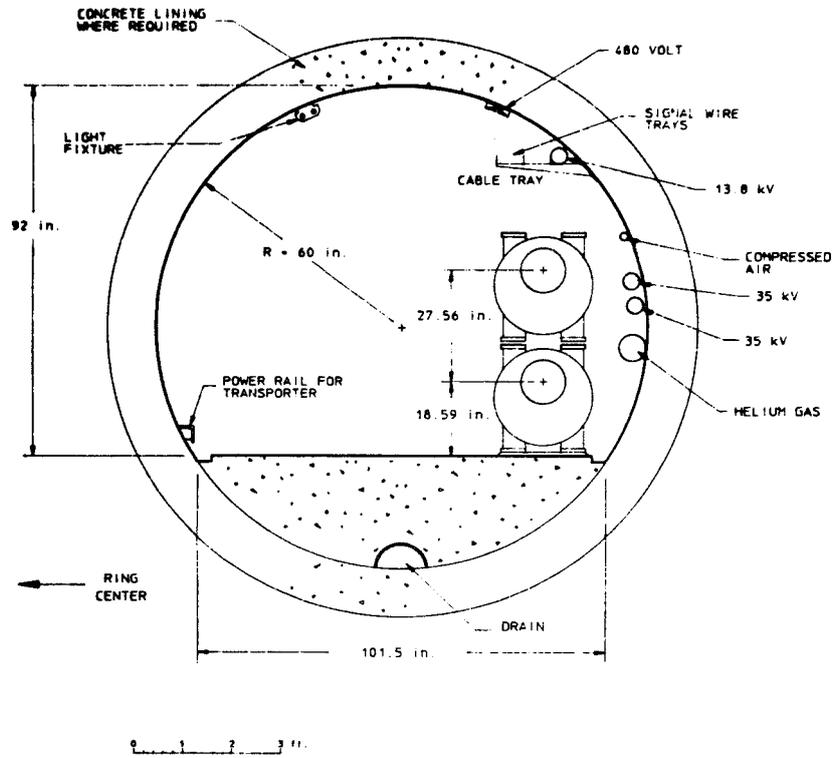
Collider tunnel cross section. Beam separation is 70 cm.
